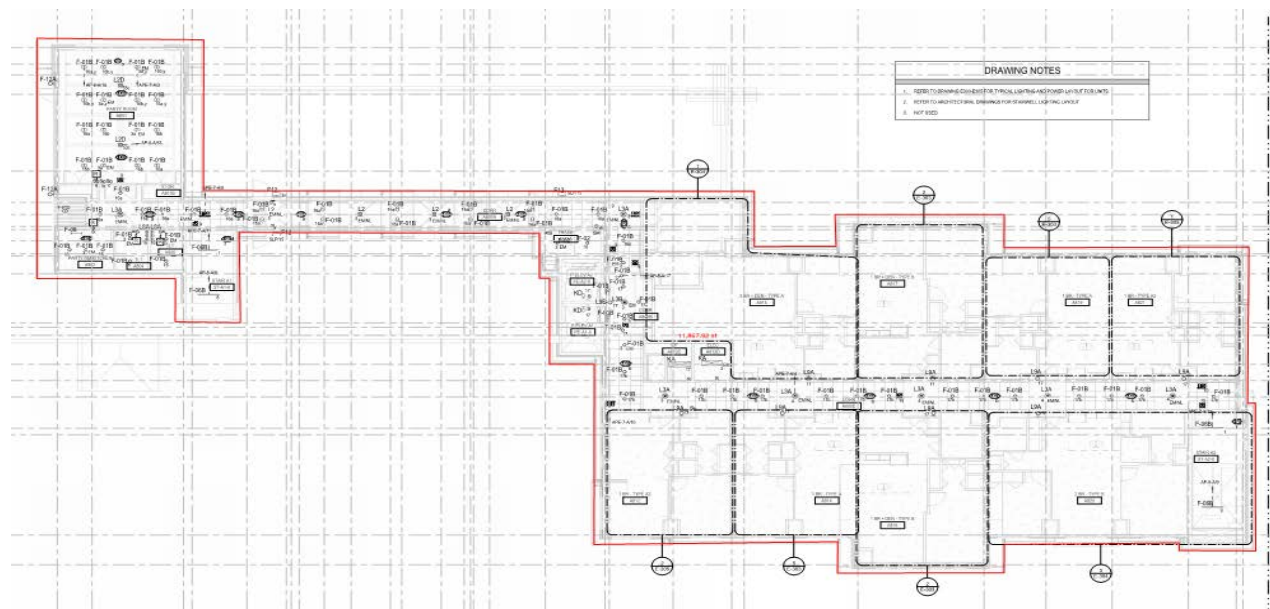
Drawing E-208A, Floor 8 lighting fixture layout, square footage 11,867.92
